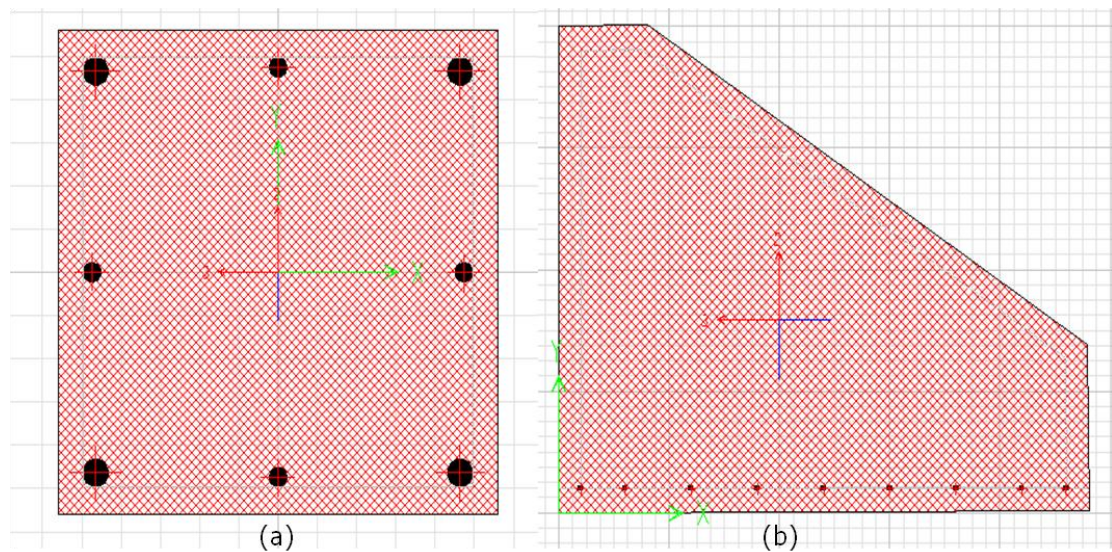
a) Column (C11A) b) Strip Foundation (in the perimeter of the foundation)
